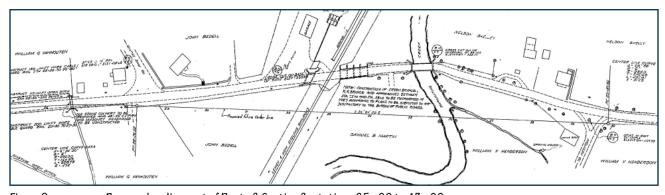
Proposed realignment of Route 8 Section 8, stations 25+00 to 43+00.
